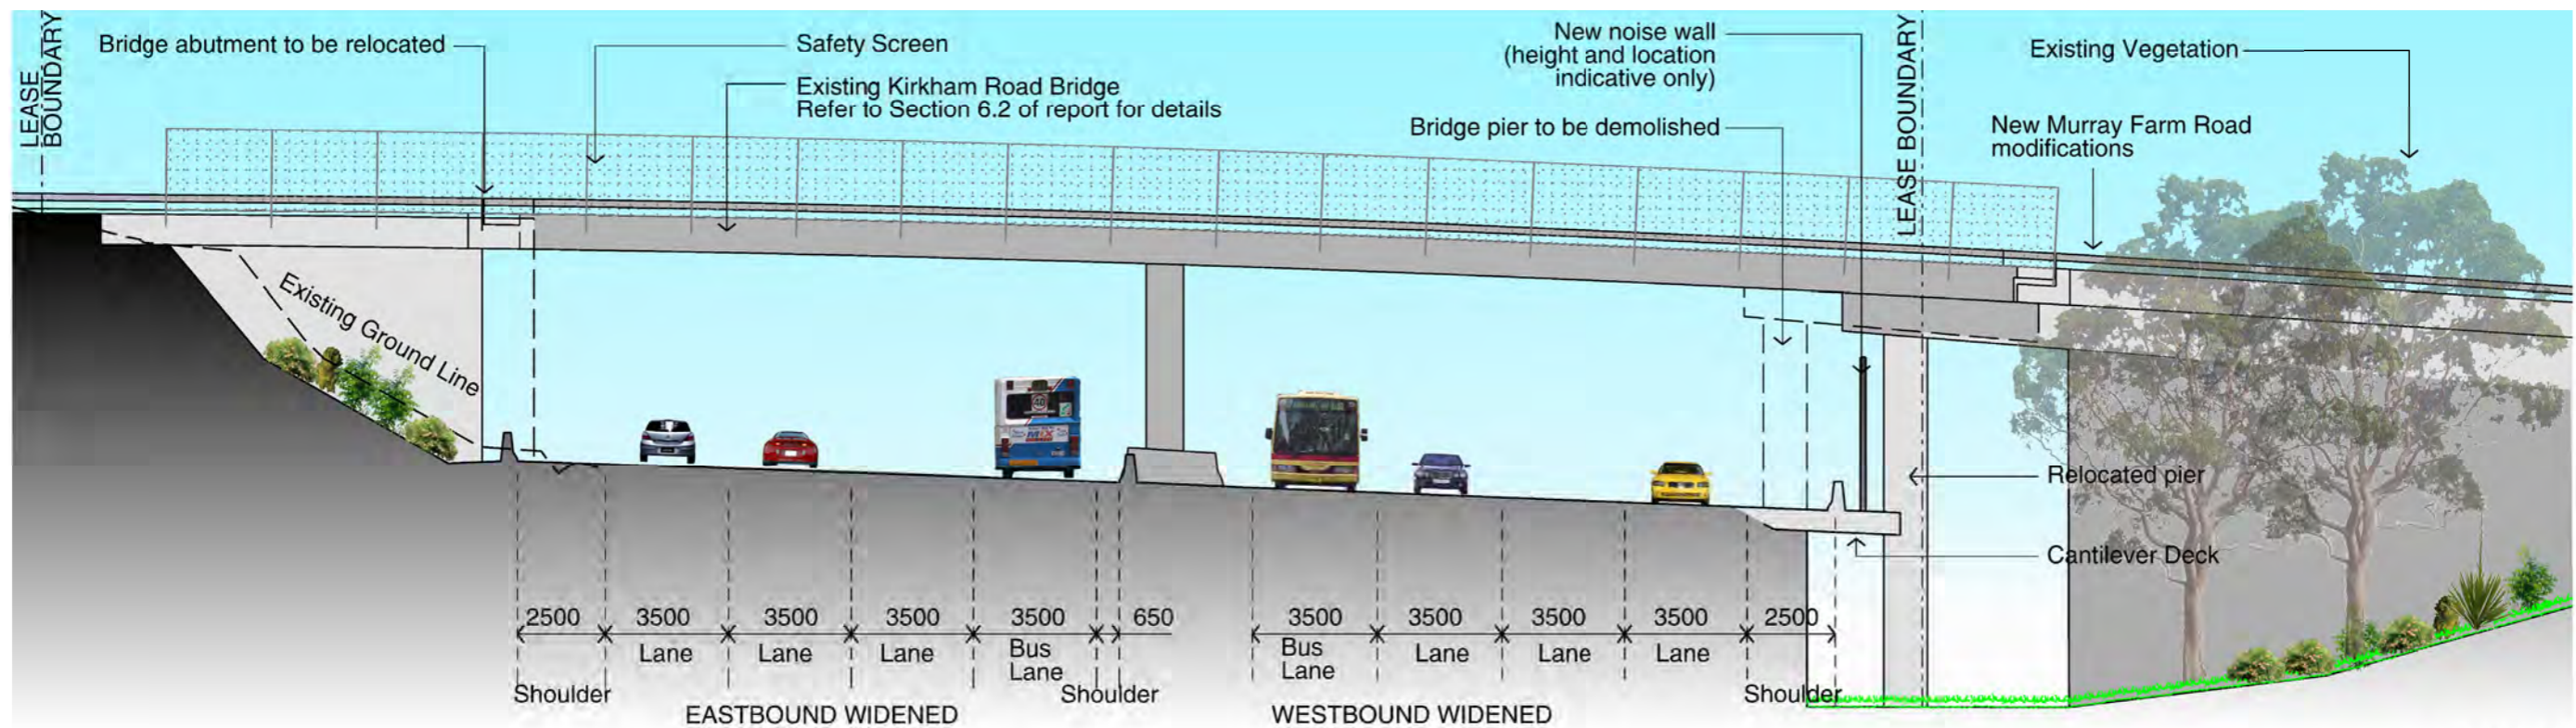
Stn 10600 Kirkham Street Bridge Area - Proposed
